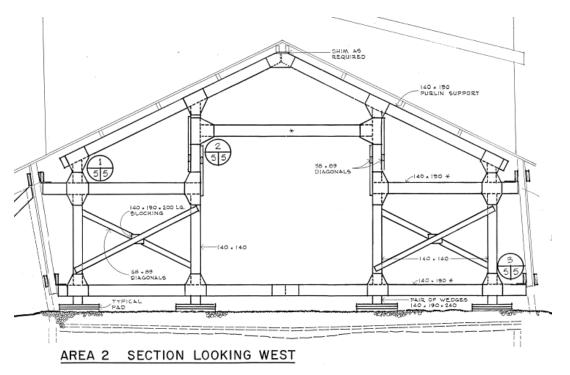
Longitudinal section, depicting the diagonal bracing between timber frames.
